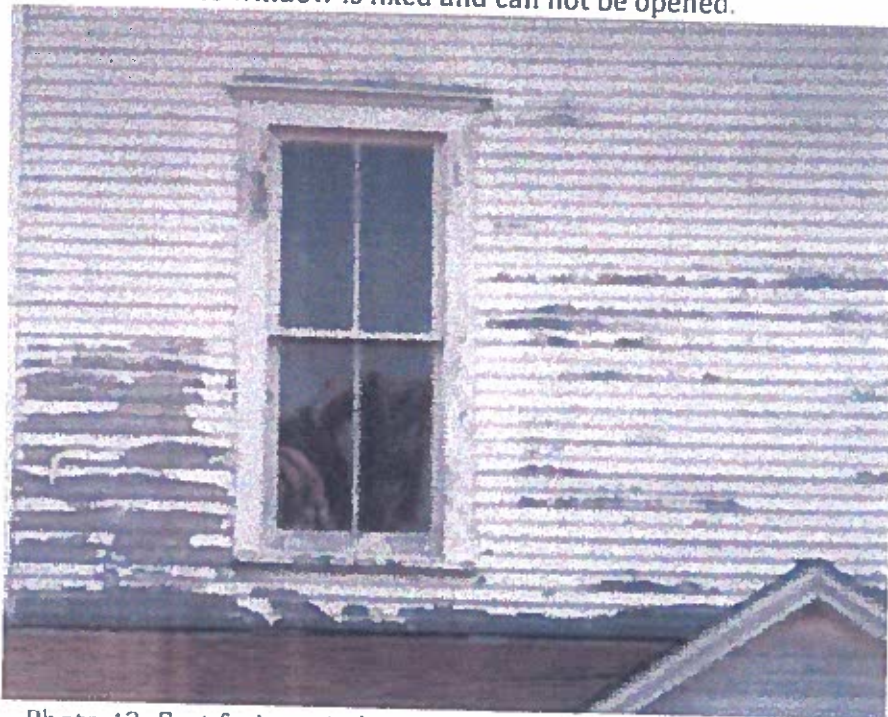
East facing window to the 2<sup>nd</sup> floor southeast bedroom.
